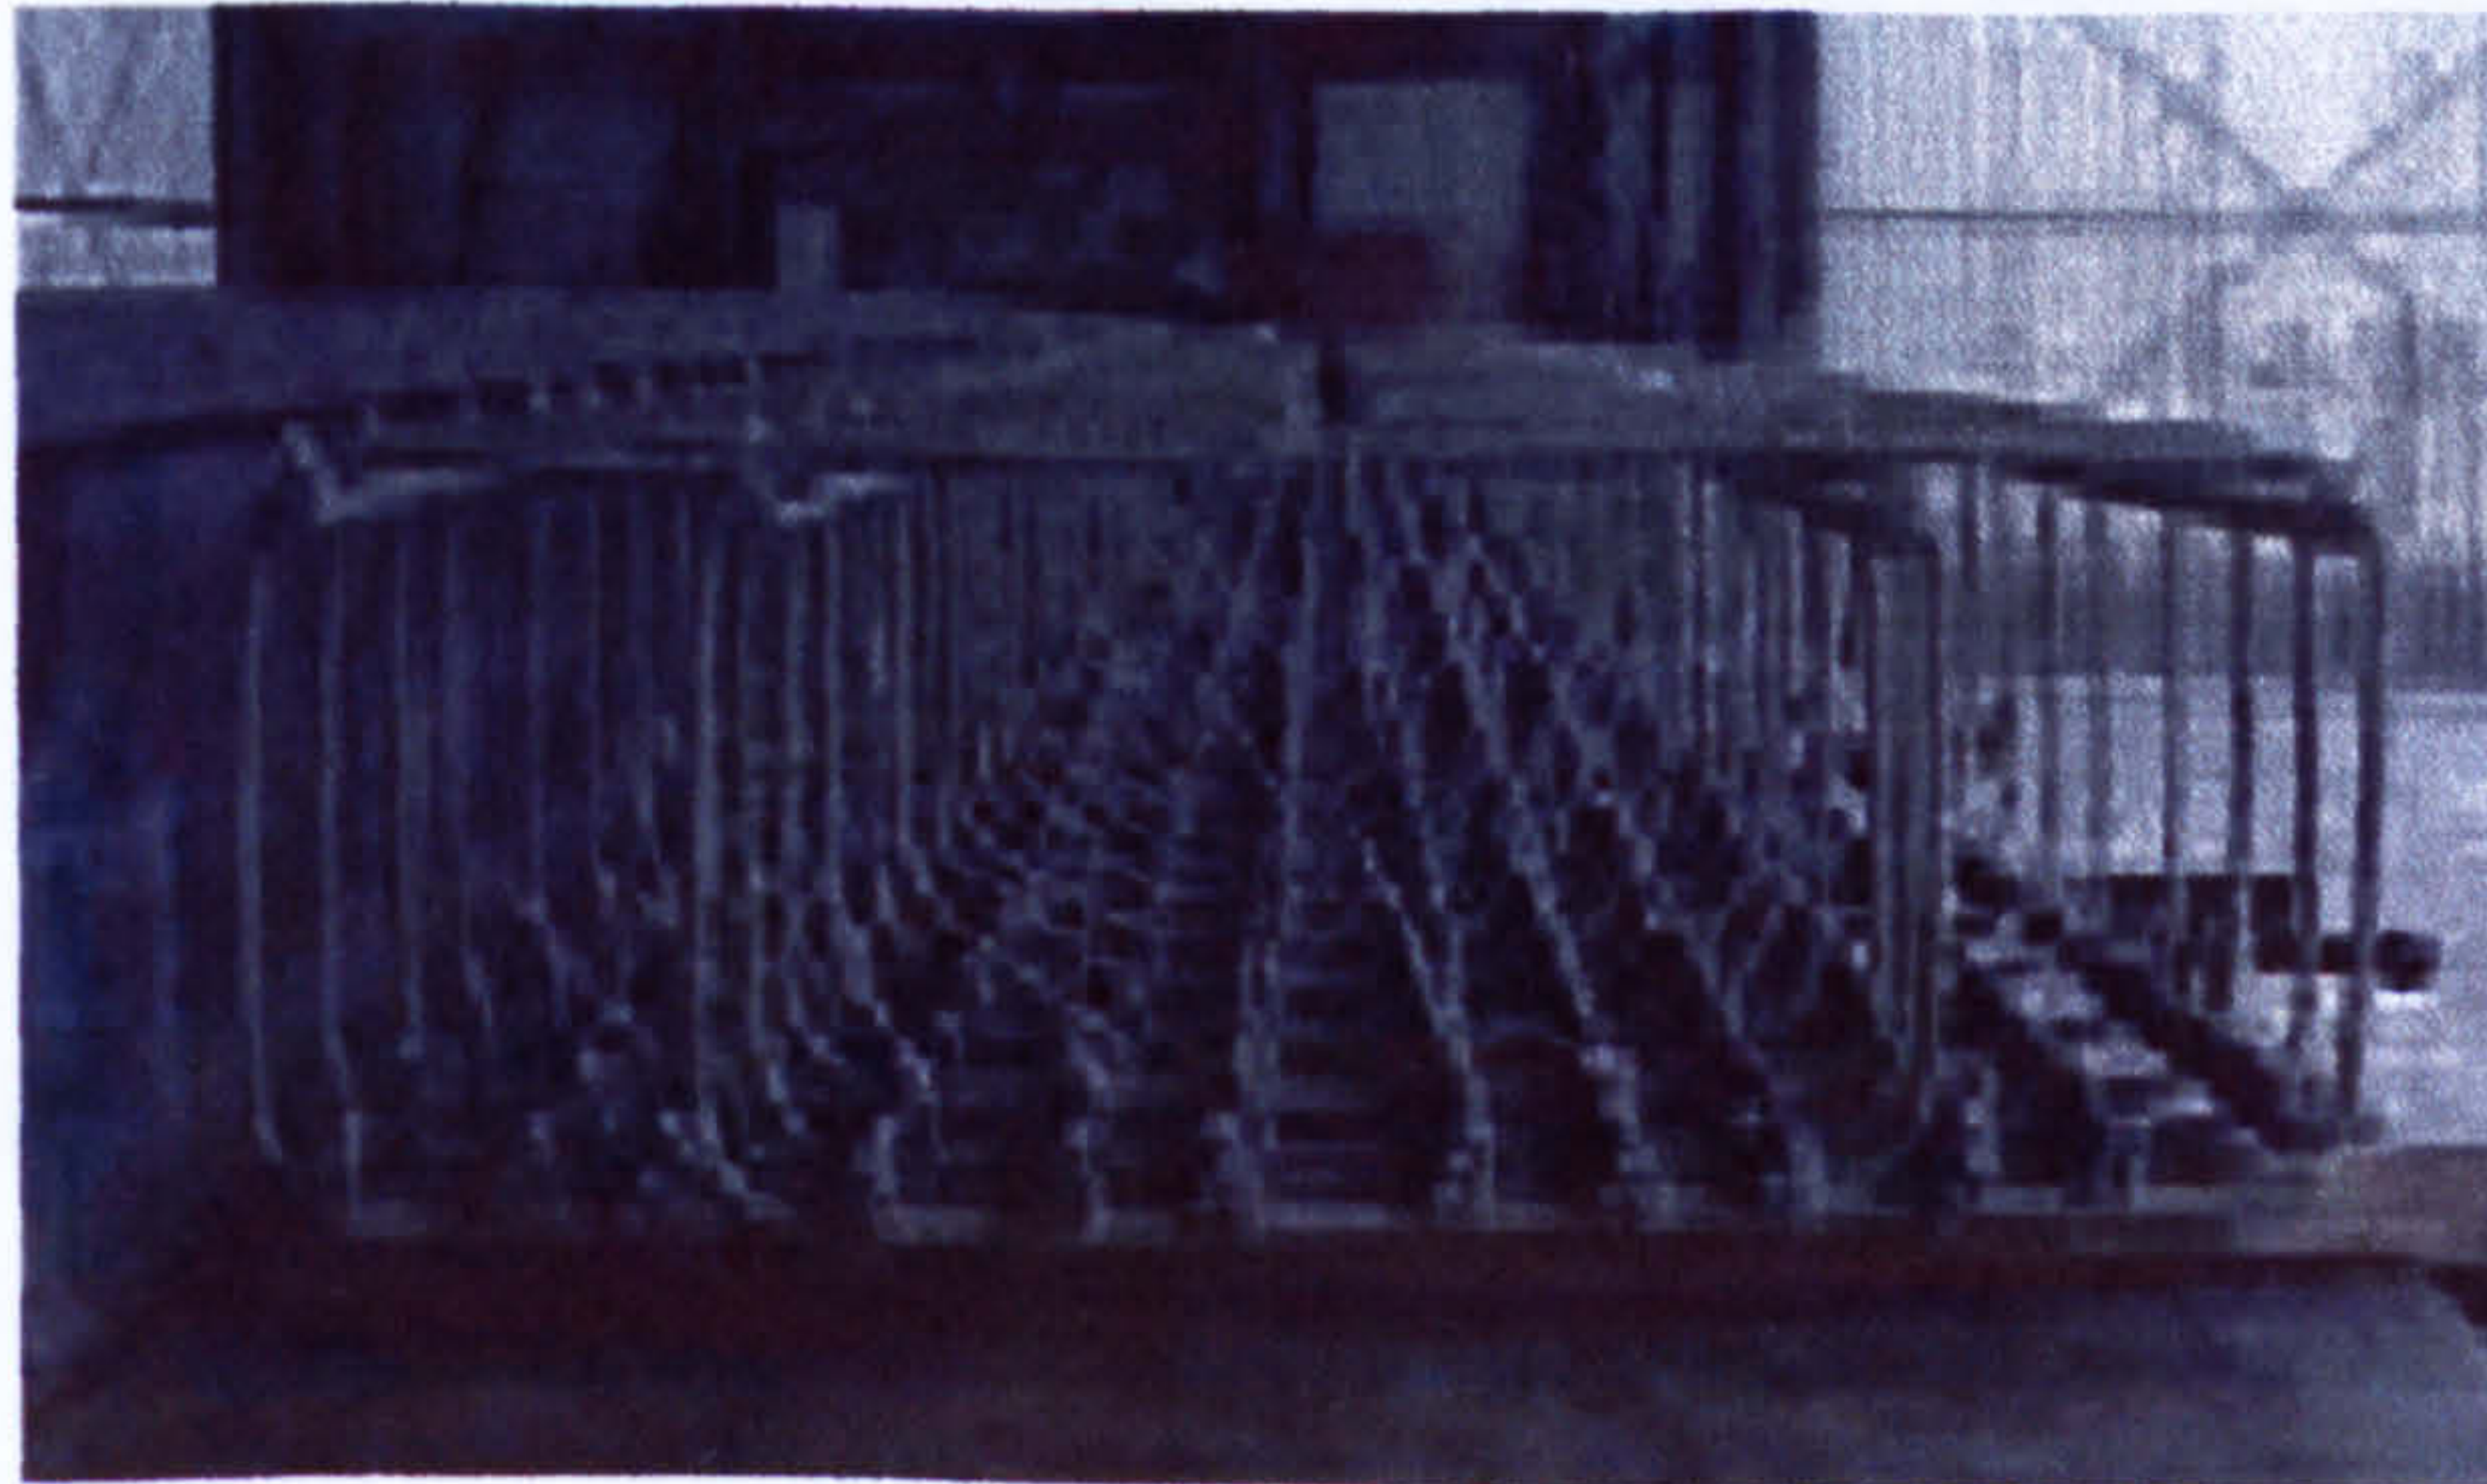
FRP cage of the Walters Street Bridge, St. James, Missouri, USA. Both GFRP and CFRP are used (After Nanni, 2001)
